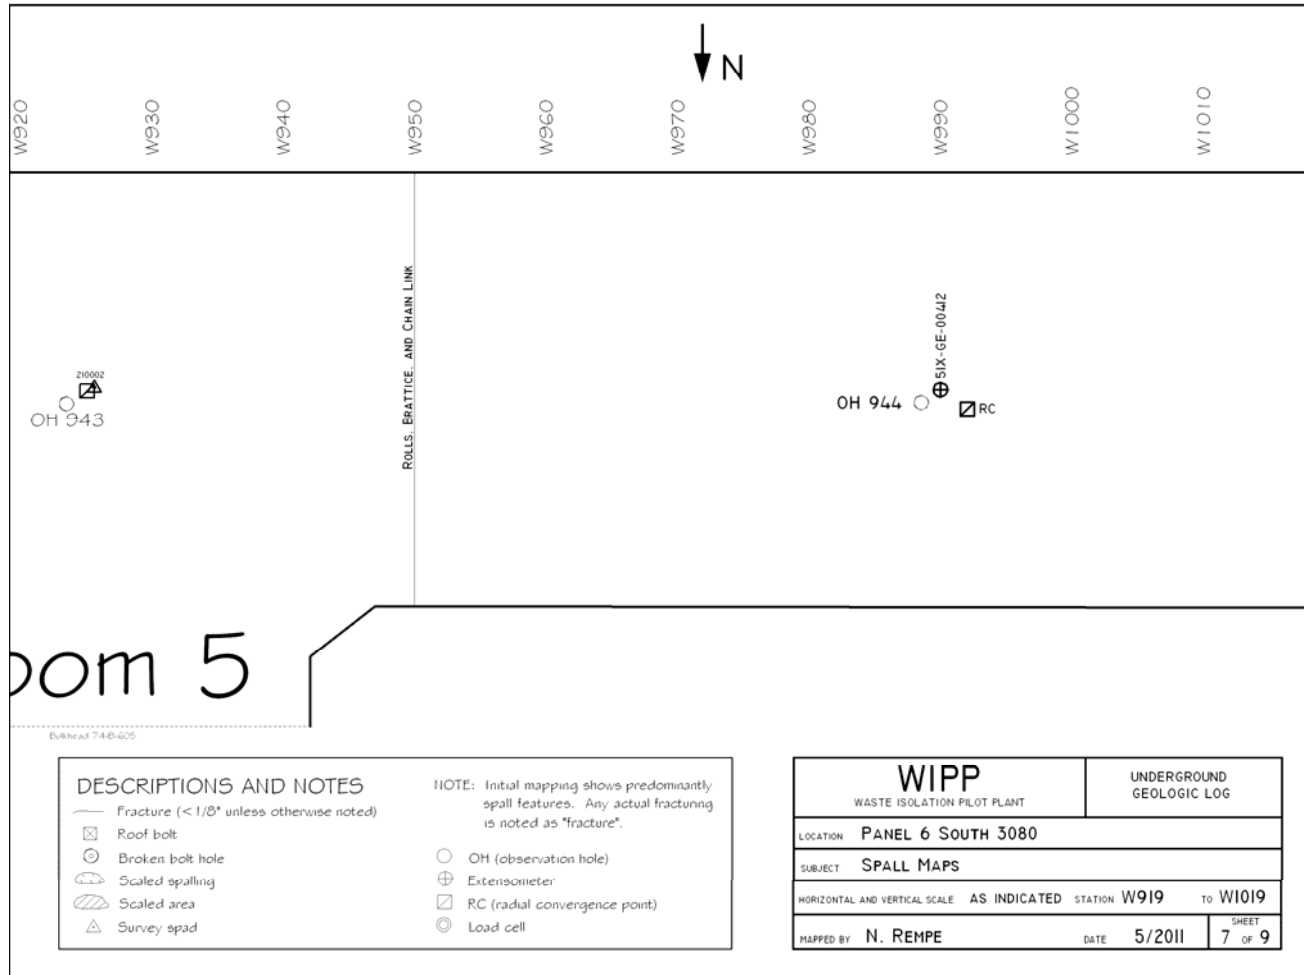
Panel 6 S3080, W390-W1210 Roof Fractures (Sheet 7 of 9)
